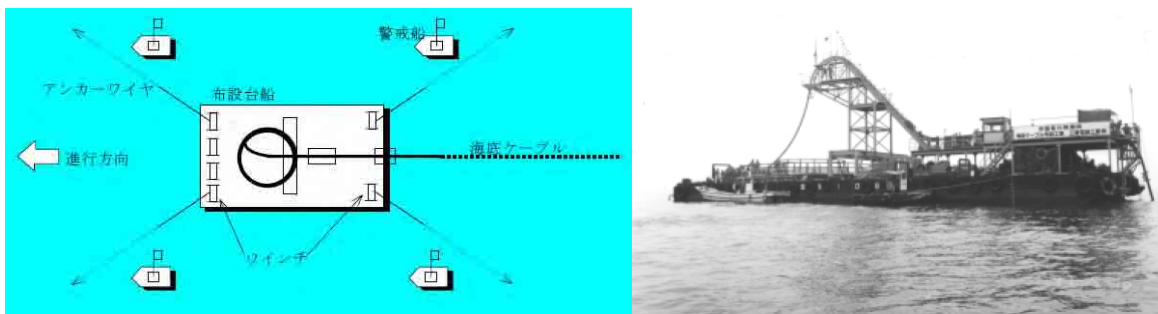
Example of Power Cable Laying Ship
